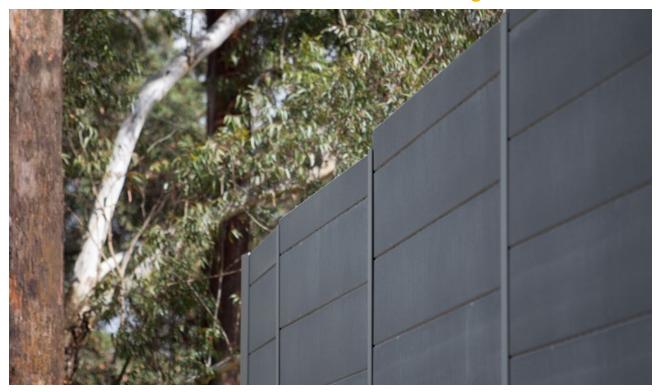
Hebel Wall Noise Barrier at the Cheltenham Services Facility Site
